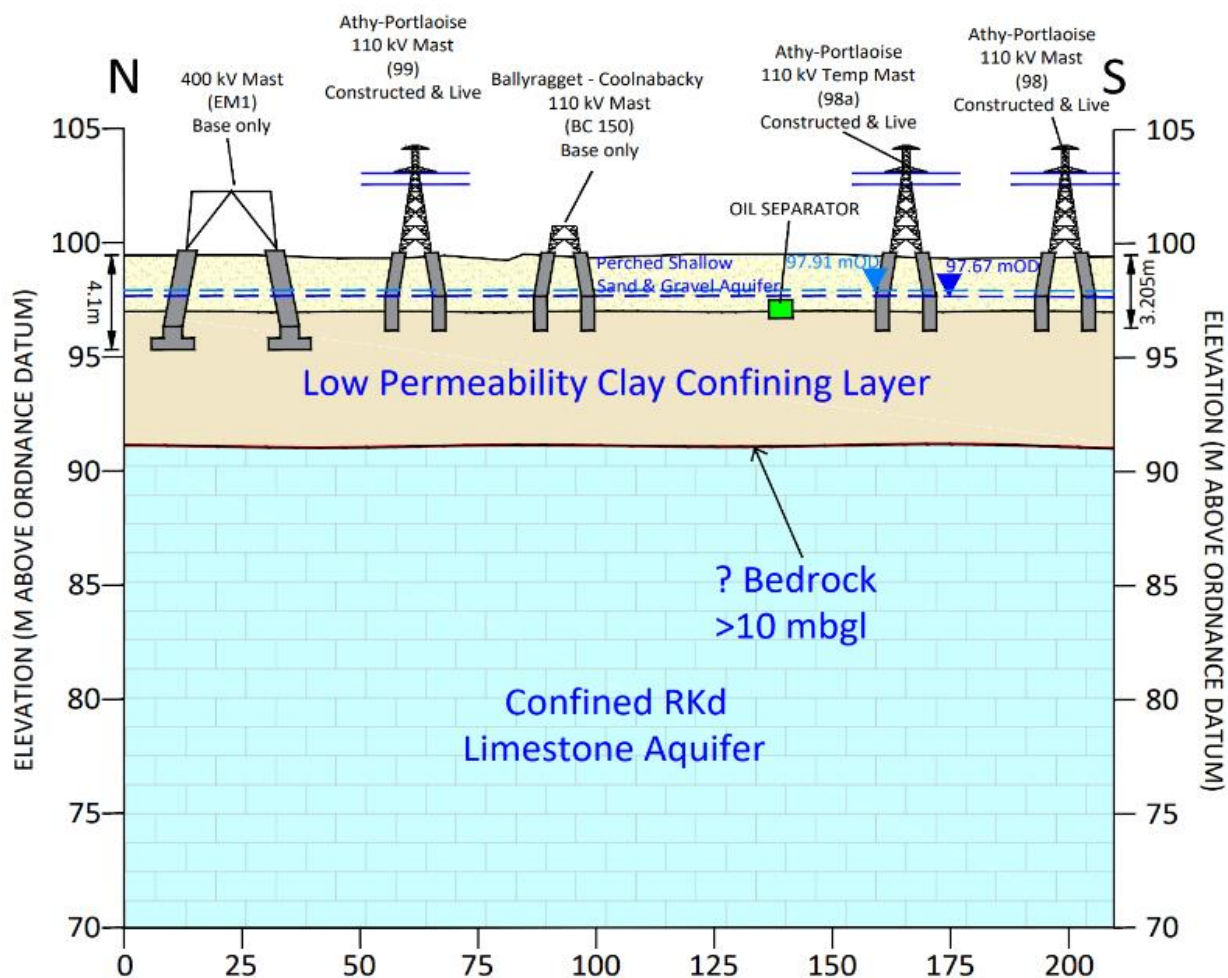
North- South Cross Section detailing existing Structures and Oil Separator
